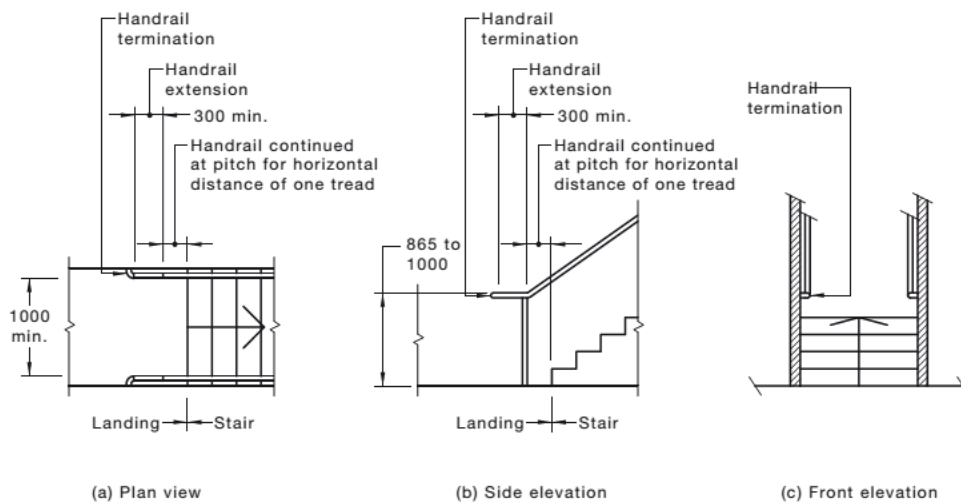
(C) STAIR HANDRAILS—HANDRAIL TERMINATIONS
